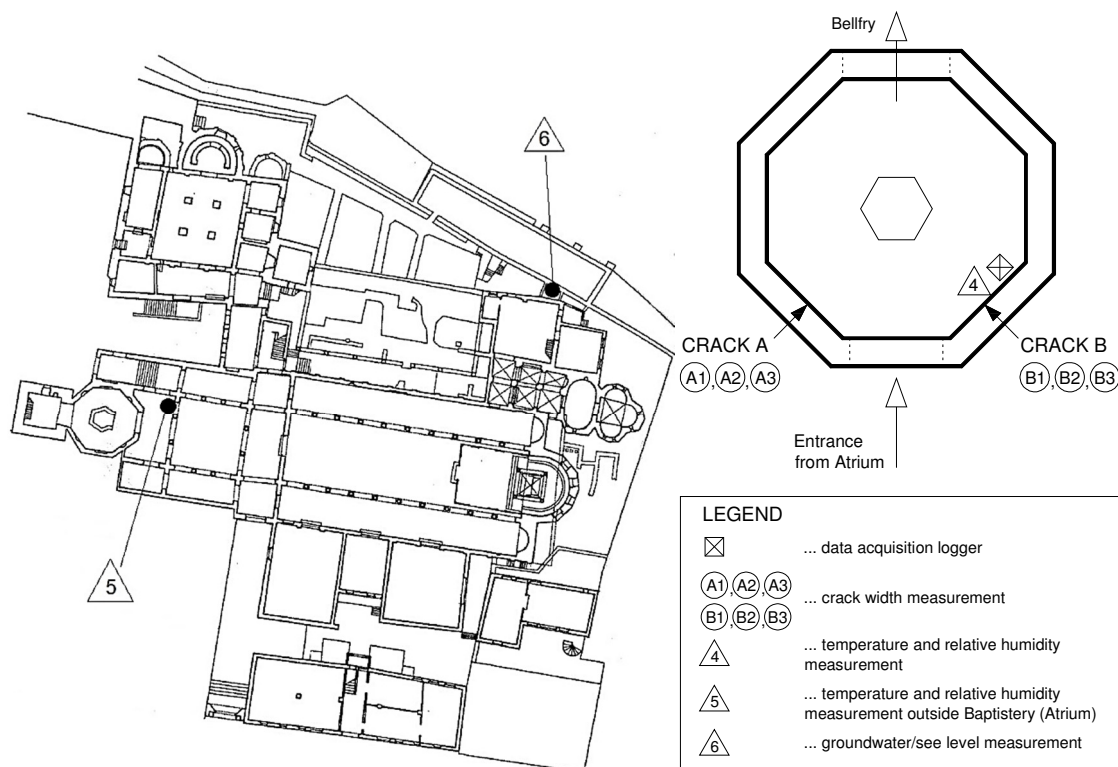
Ground plan of the Episcopal Complex (adopted from Terry and Gilmore Eaves, 2001) with enlarged plan of the baptistery showing the layout of the static monitoring system.
